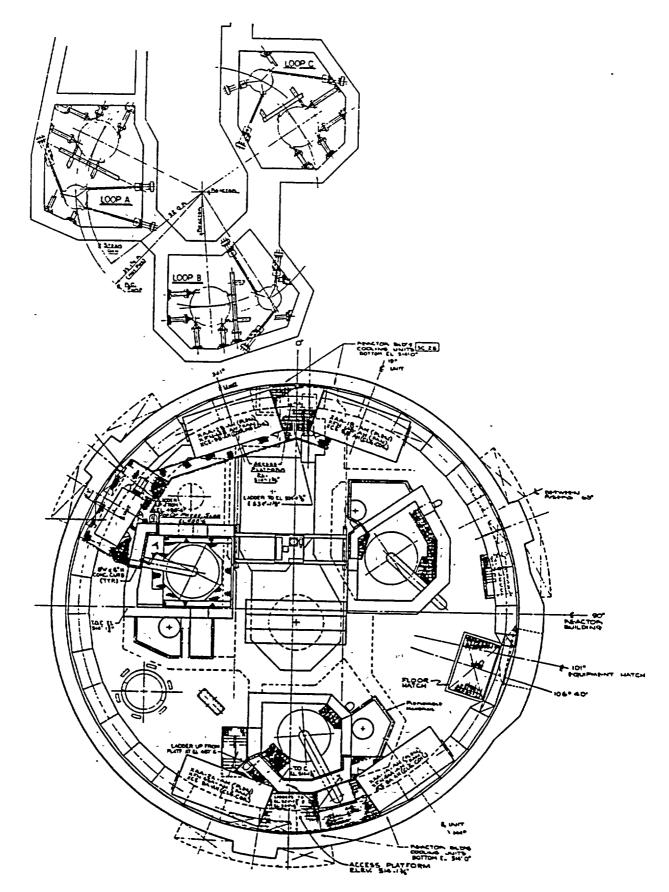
Plan View of the Summer Large, Dry Containment (3-D Post-Tensioned Concrete)
